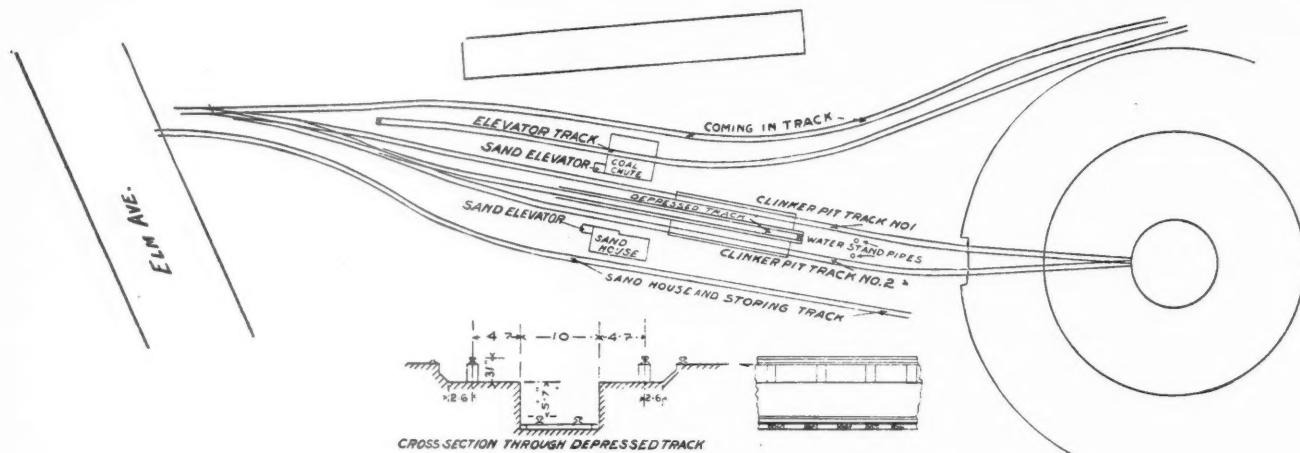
Layout of Michigan Central Engine Terminal at Jackson Junction, Mich.
